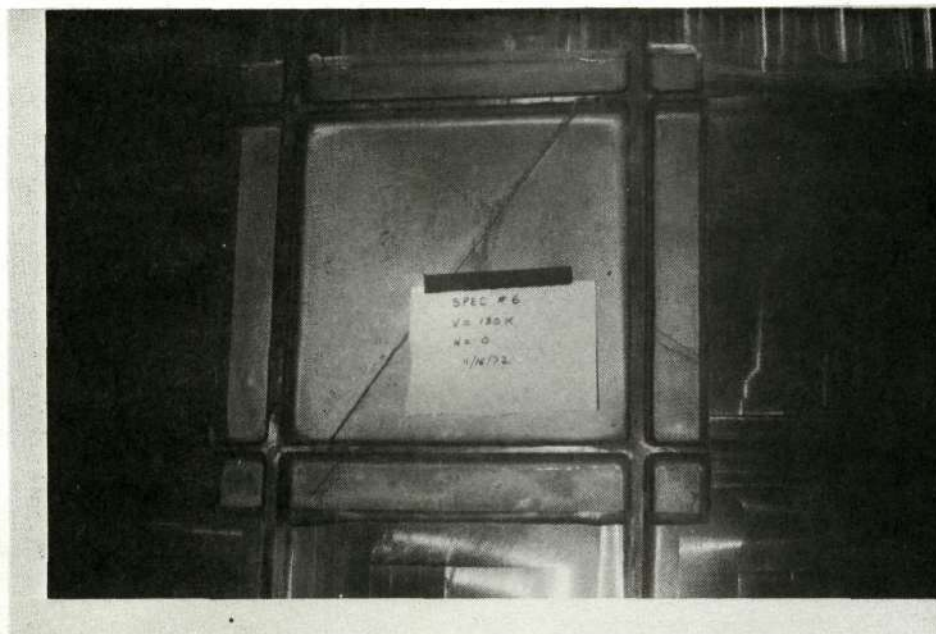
A PANEL 6 UNIAXIAL LOAD
